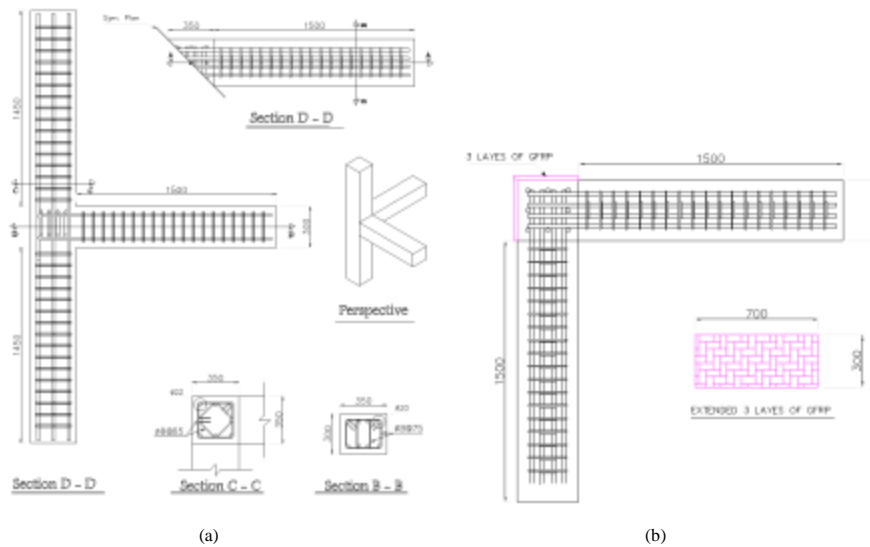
(a) Specimen geometry and details; (b) Rehabilitation scheme
